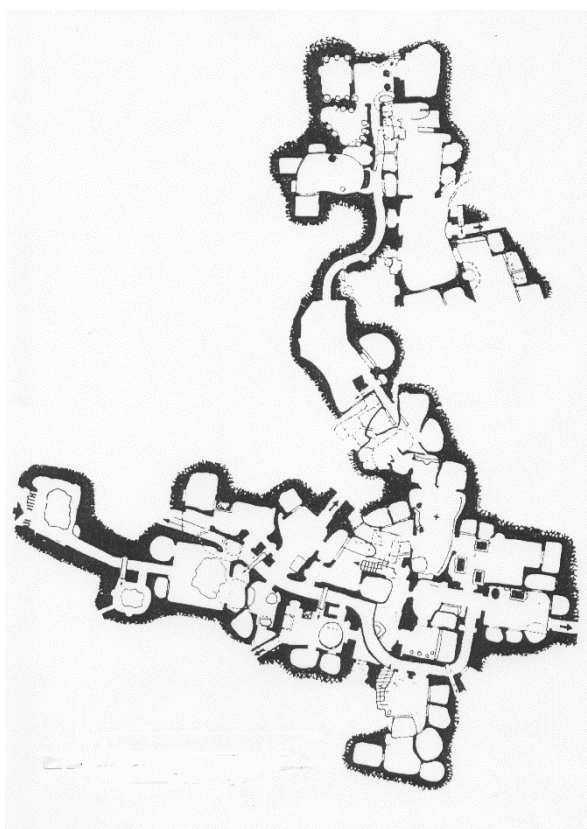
Derinkuyu in Cappadocia; plan of the “under-ground city”
